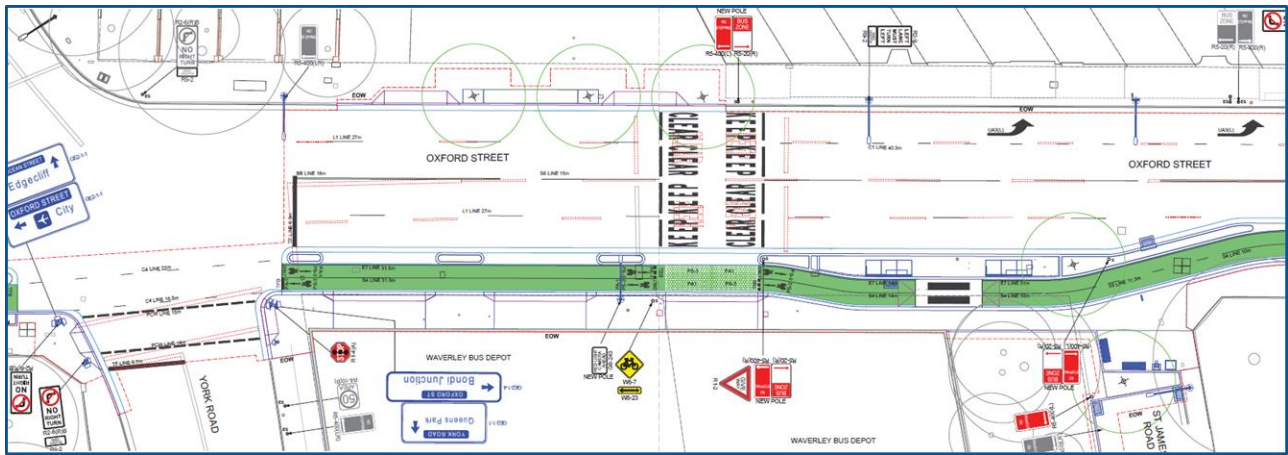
Bondi Junction Cycleway – York Road to St James Road.
